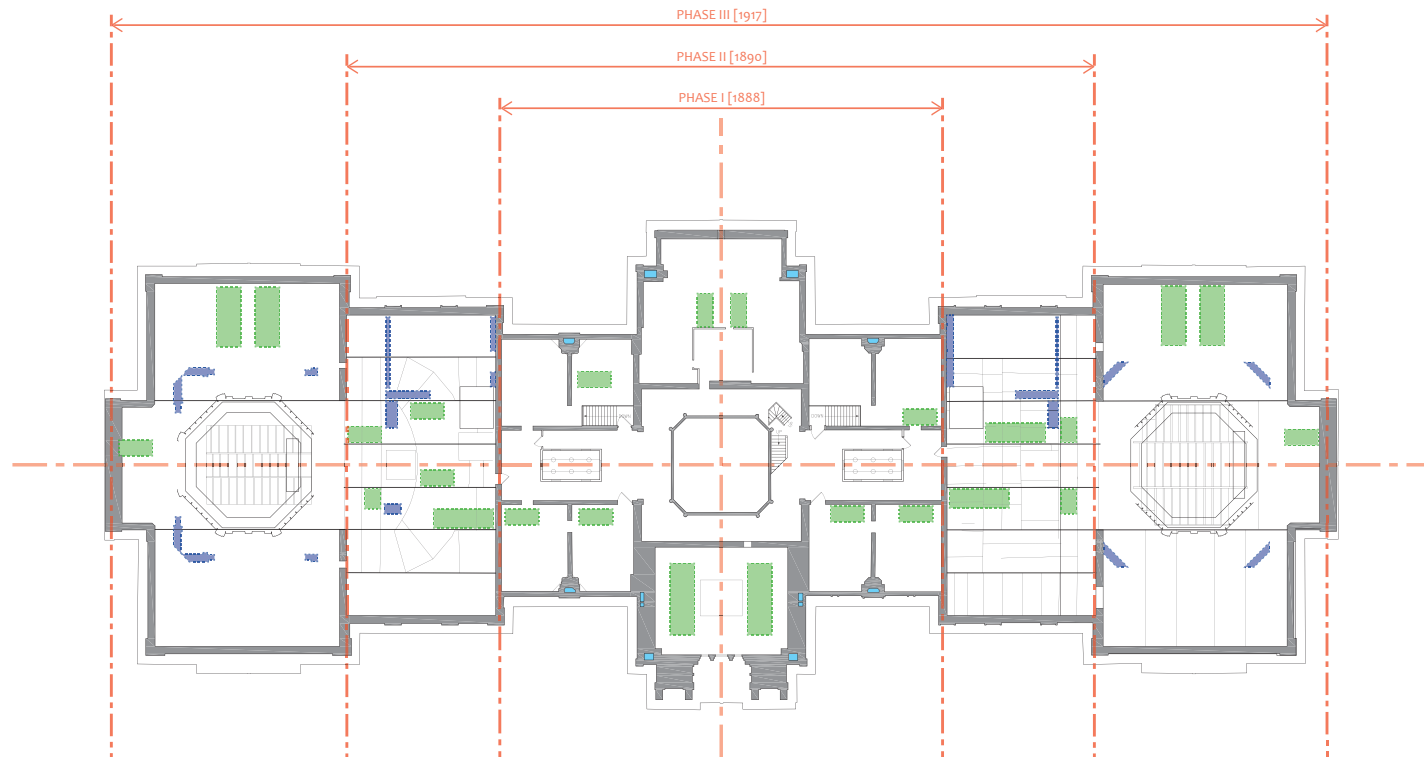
Attic Level Plan, Indicating Proposed Locations for Mechanical Rooms [Green] and Proposed Vertical Riser Locations [Blue].
